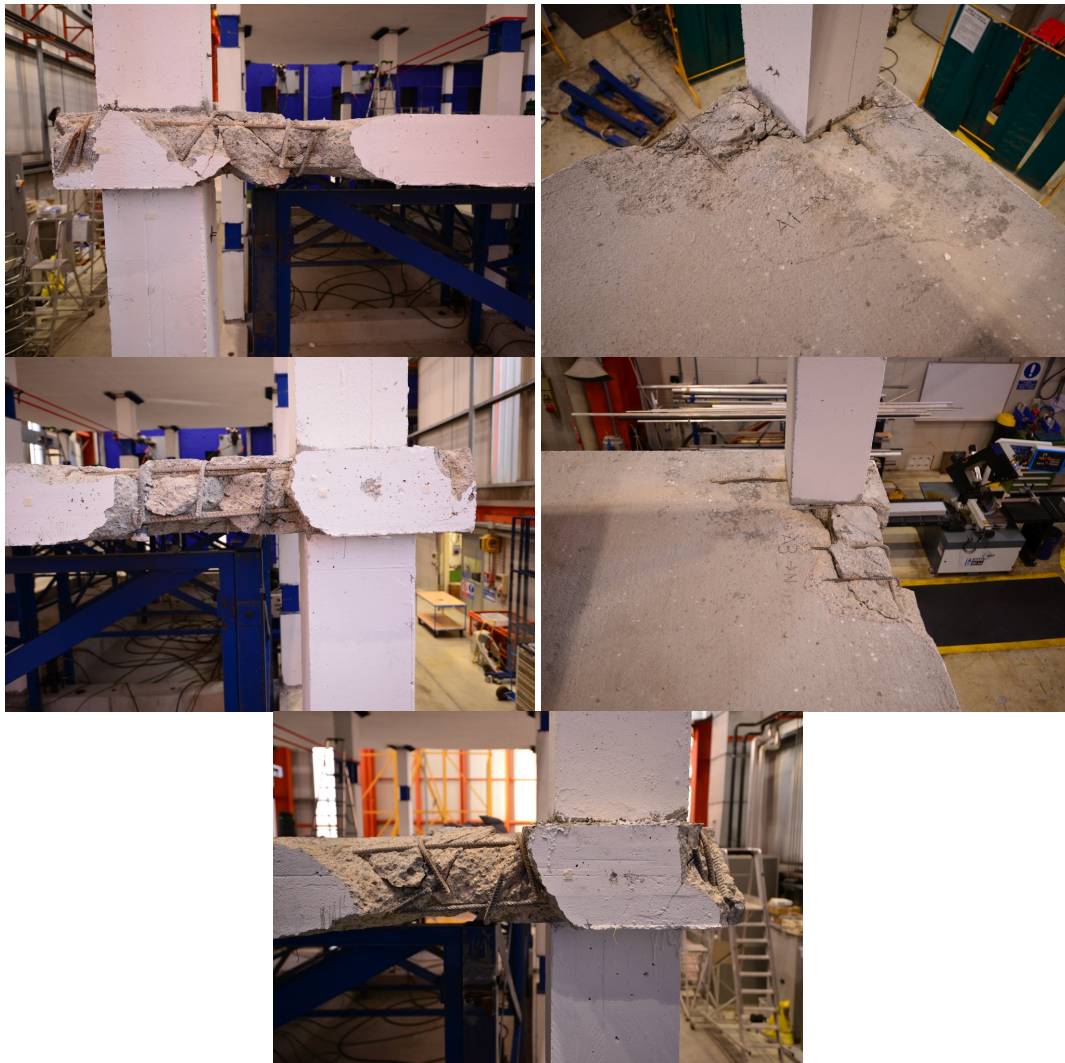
SlabSTRESS 1st floor slab damage, corner connection (clockwise) a) and b) A1 west, c) and d) A3 west, e) D1 east.
